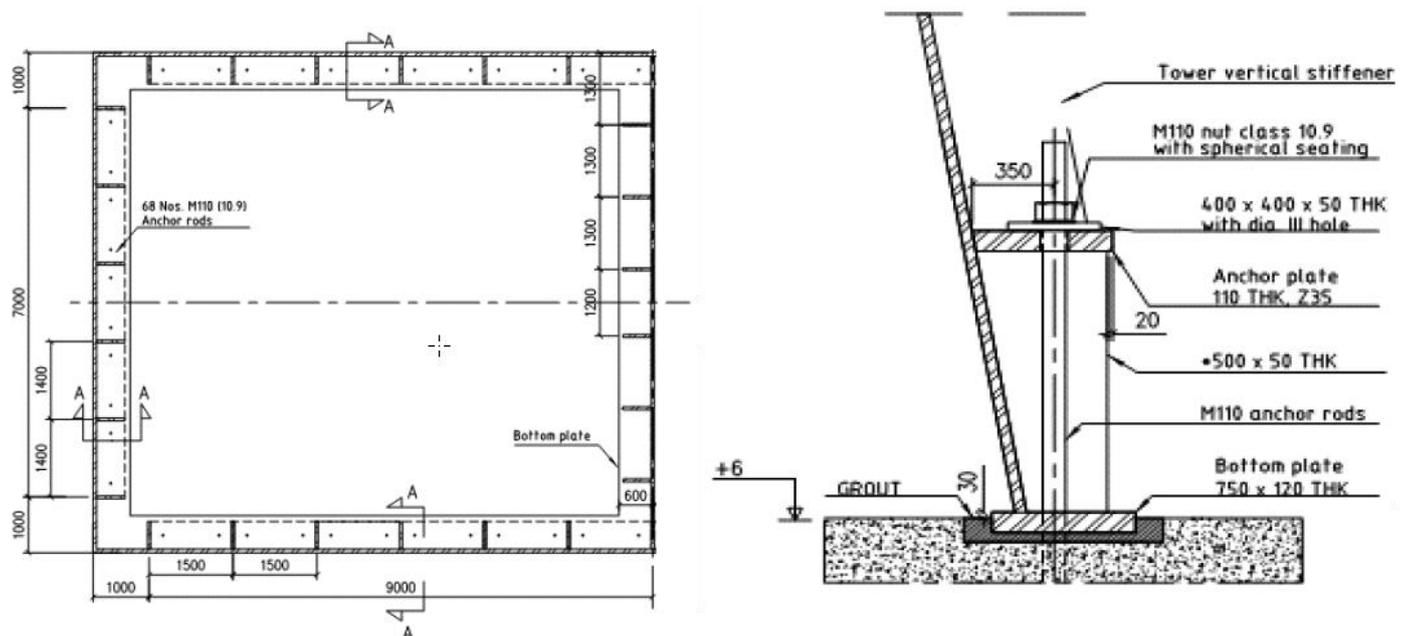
Connection flange to the reinforced concrete foundation – An example from a suspended bridge concept. Taken from attachment 4, p.70.
